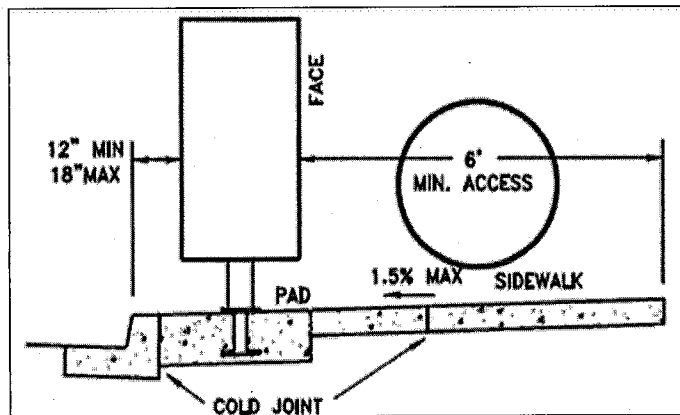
72-inch (6-foot) minimum accessible turning space
